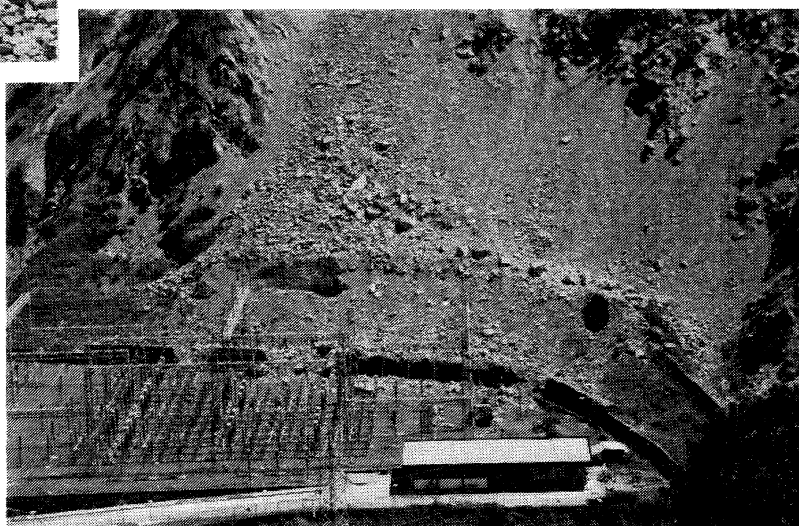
La Trinidad substation, Baguio; arrestor frames jacked back to level and foundation backfilled
